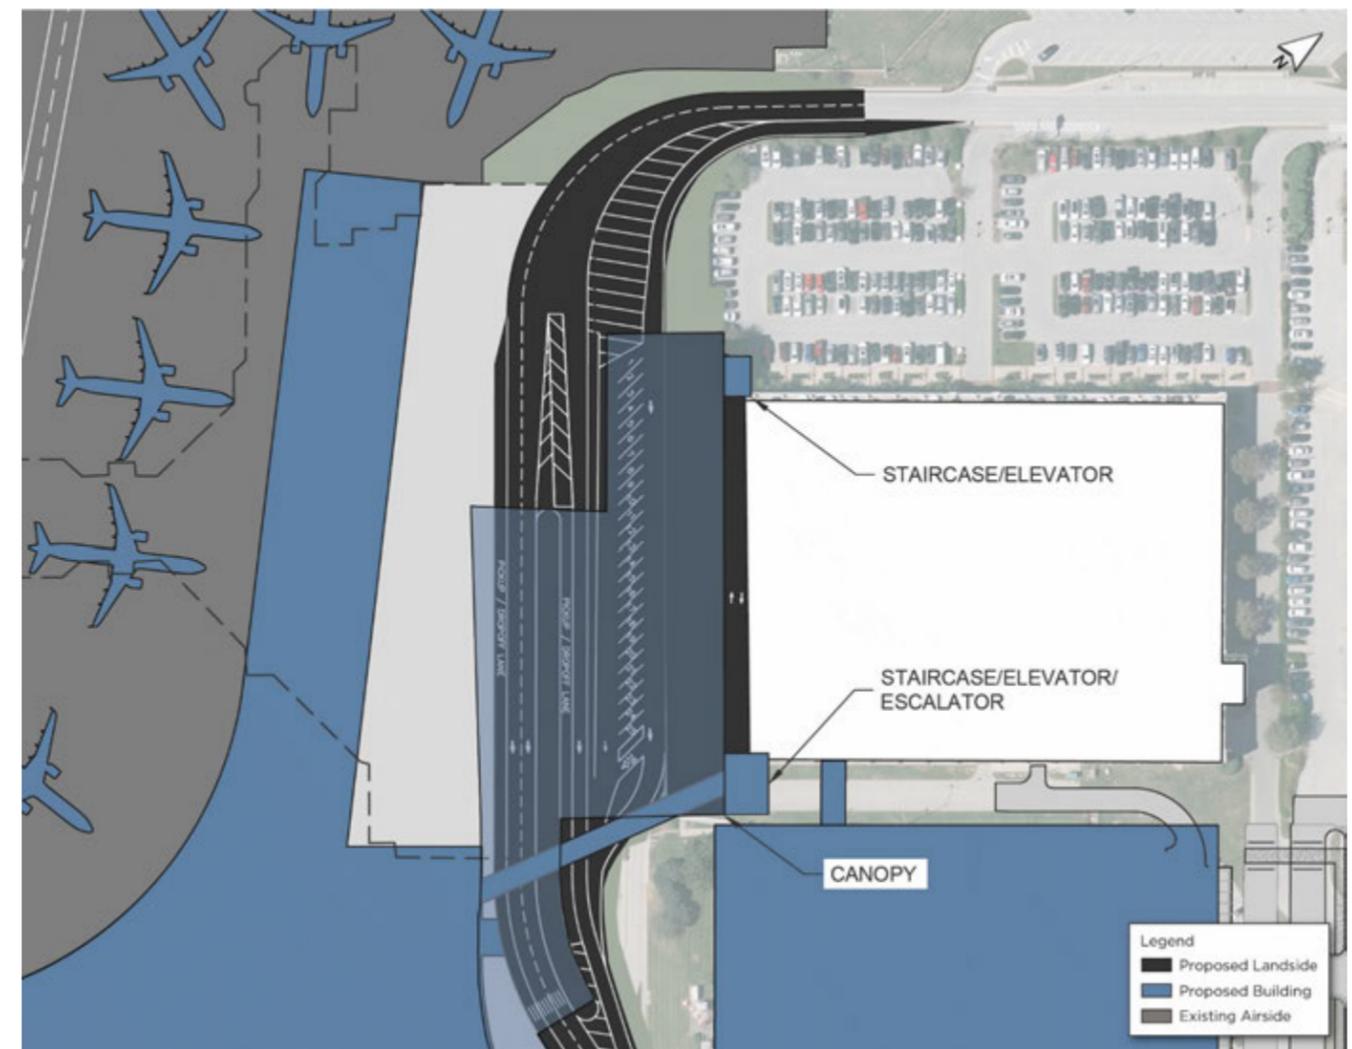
, Concept 4 GTC Cross Section (Full Build-Out), presents the cross section of lanes and curbs planned for the GTC in the Full Build Out configuration for Concept 4. Exhibit 4.2-14, Concept 4 GTC Plan (Full Build Out), presents the GTC plan for Concept 4 in the Full Build Out configuration.
